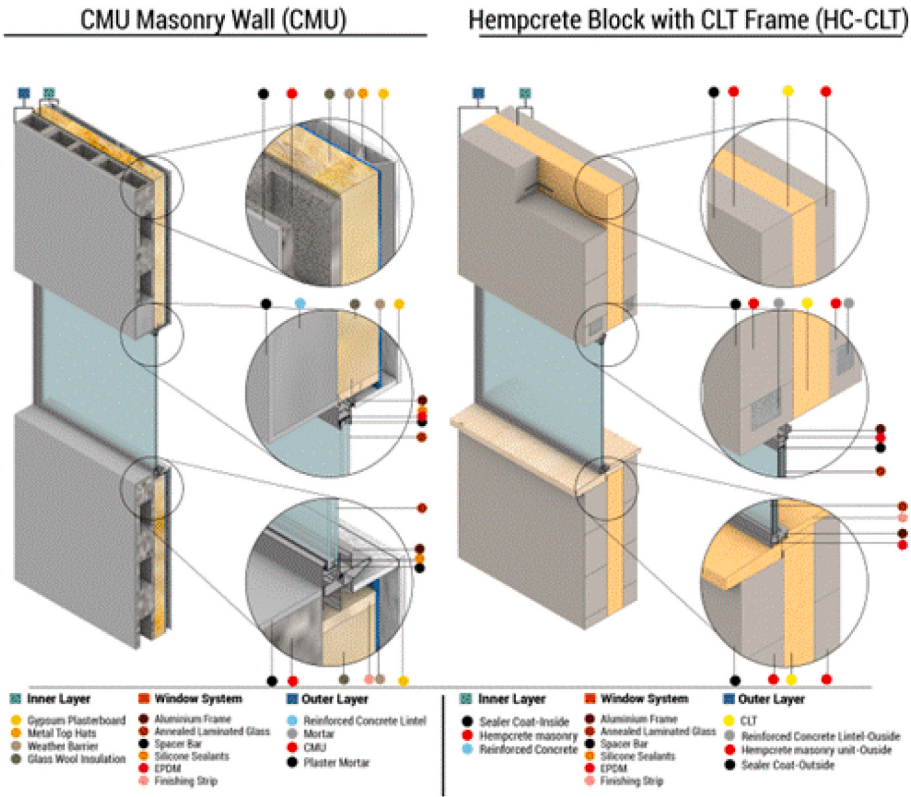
Assembly Details of CMU Masonry Wall and Hempcrete Block with CLT Frame (HC-CLT) Systems.
